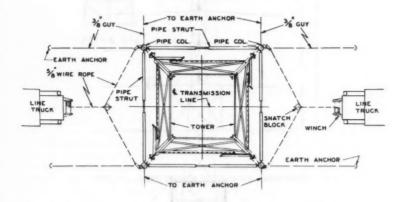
PLAN OF WIRE ROPE LINES FROM TOWER TO WINCH
